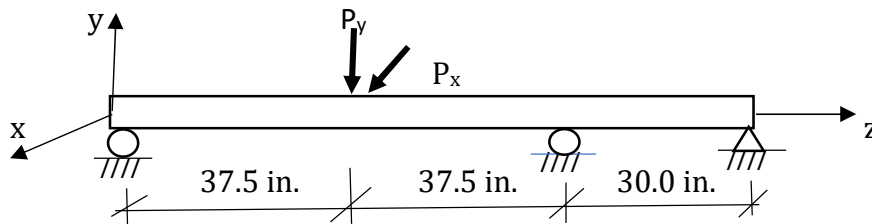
12 in. x 12 in. x 1/2 in. Three Span I beam. Point Load Center Span
